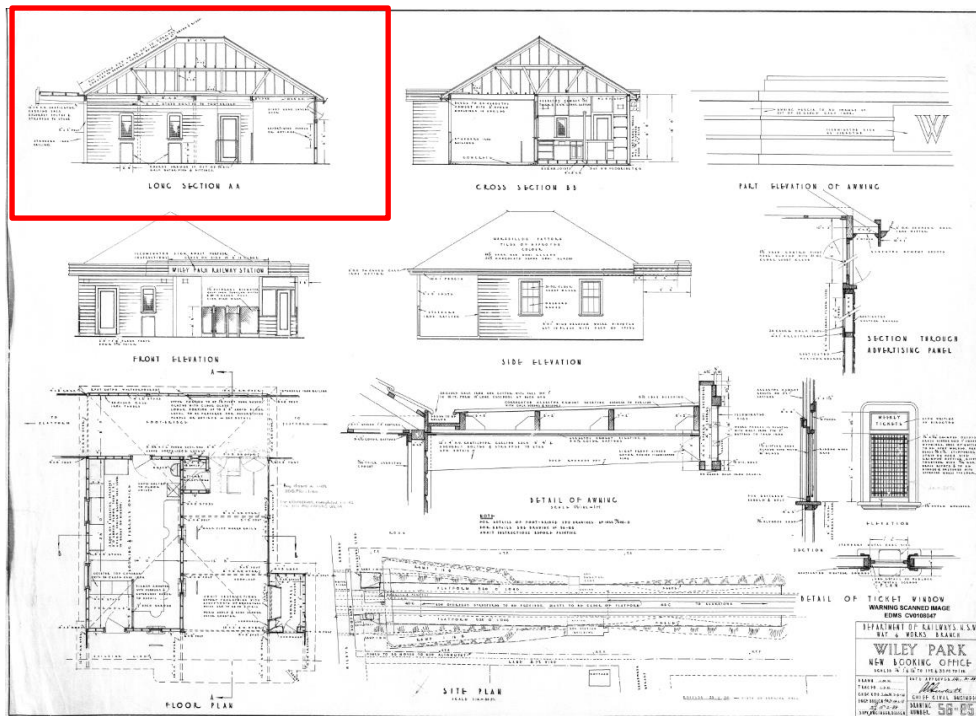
Wiley Park Overhead Booking Office Plan, 1938. Source: Sydney Trains Plan Room
